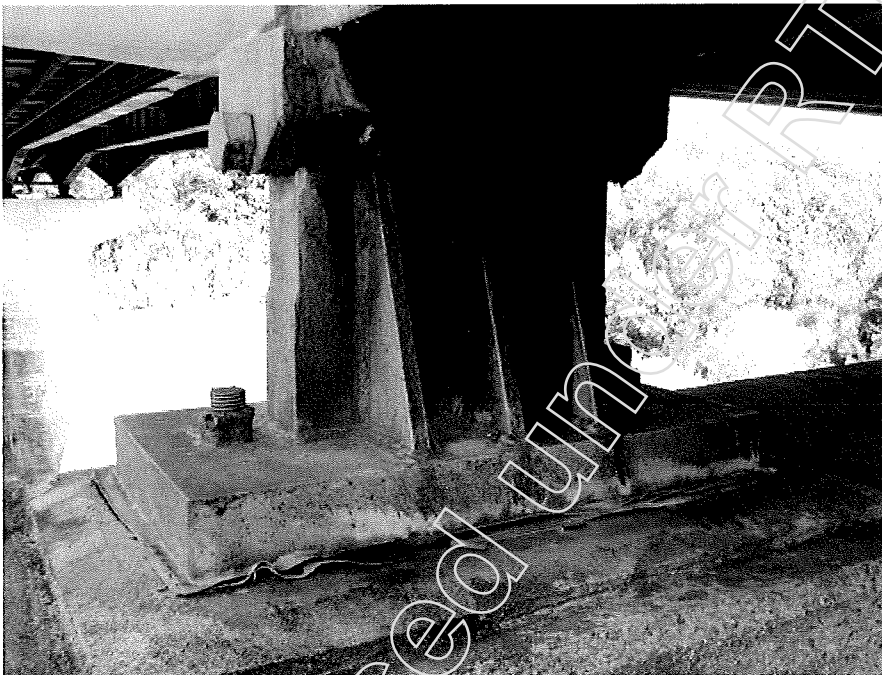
View of the corroded nut on the Pier 2 fixed bearing
